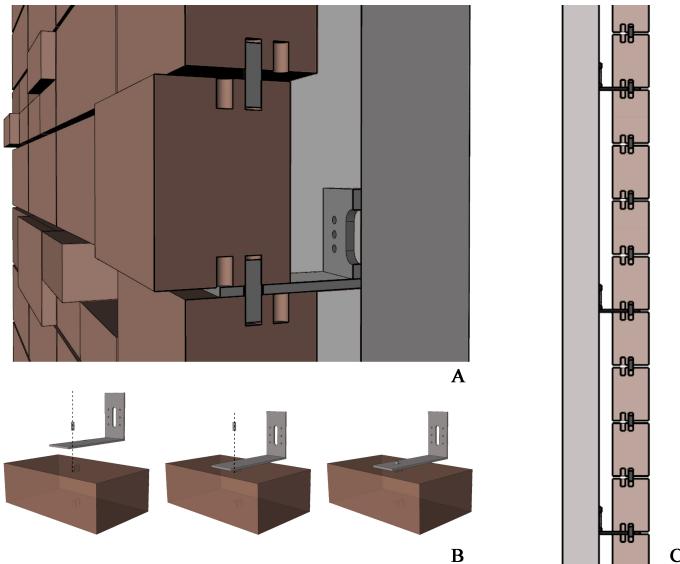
A - A facade section showing how the brick grooves create different brick placements; B - The fitting process of the angled brackets and metal profiles; C - A section of the facade model showing the thermal isolation zone.
